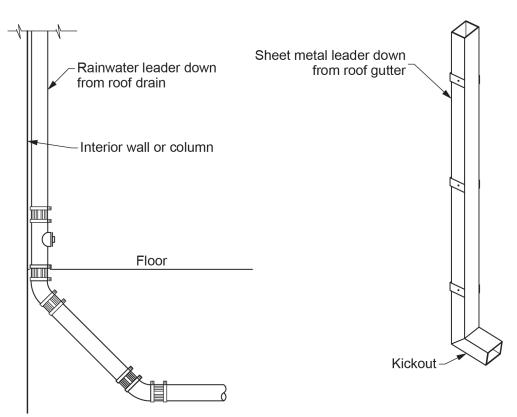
Interior and exterior rainwater leaders. (Skilled Trades BC, 2021) Used with permission.
